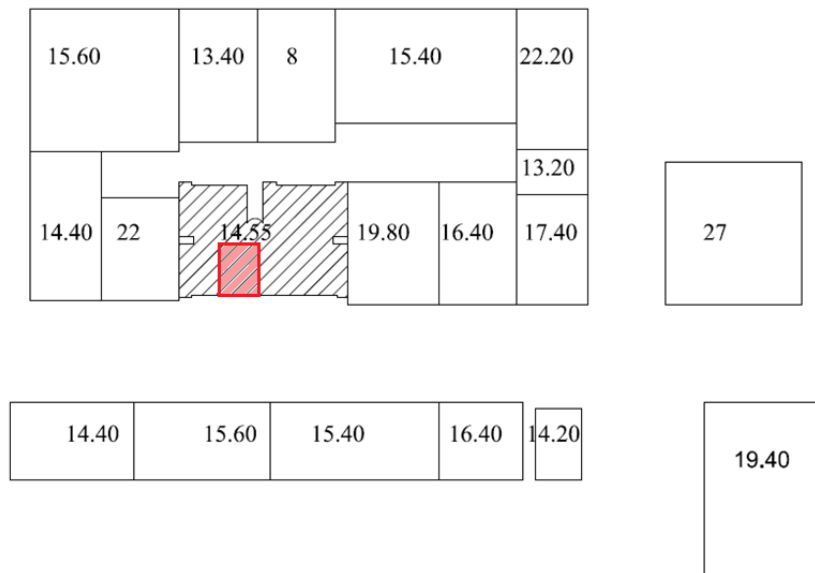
Plan layout of the building studied (shaded) and its surroundings in IESVE, indicating the heights of the buildings in metres and the location of the apartment under investigation in the building (shaded red)
